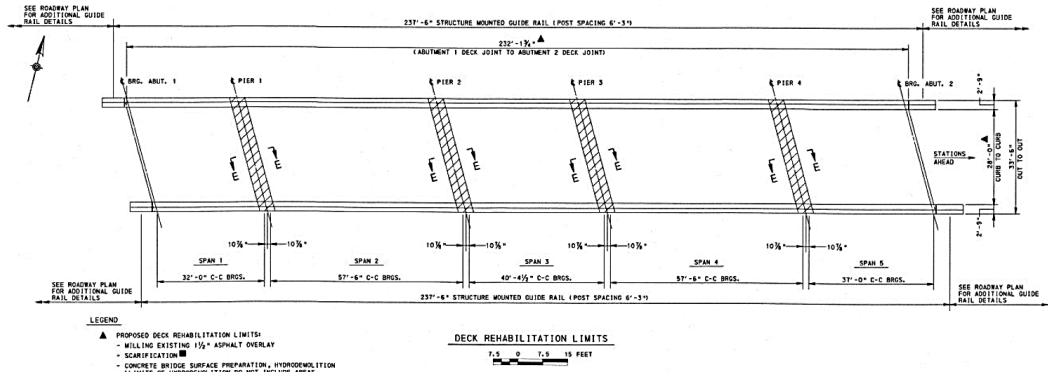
As-Built Plan (Plan View) Bridge No. 22387
